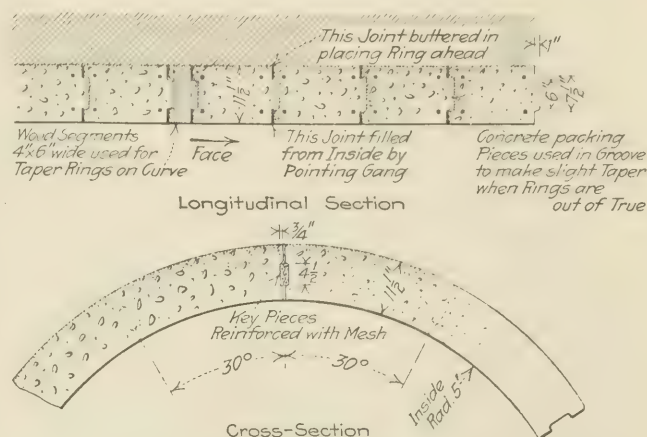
SKETCH SHOWING CONCRETE BLOCK DESIGNED BY CITY'S ENGINEERS
